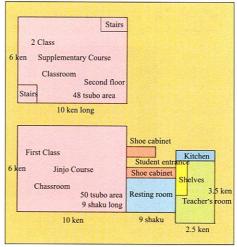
Plan view of Kumagawa Jinjo Koto Shogakko schoolhouse (about 1899 (Meiji 32)). At that time, a class used a whole floor of a two storied building.
